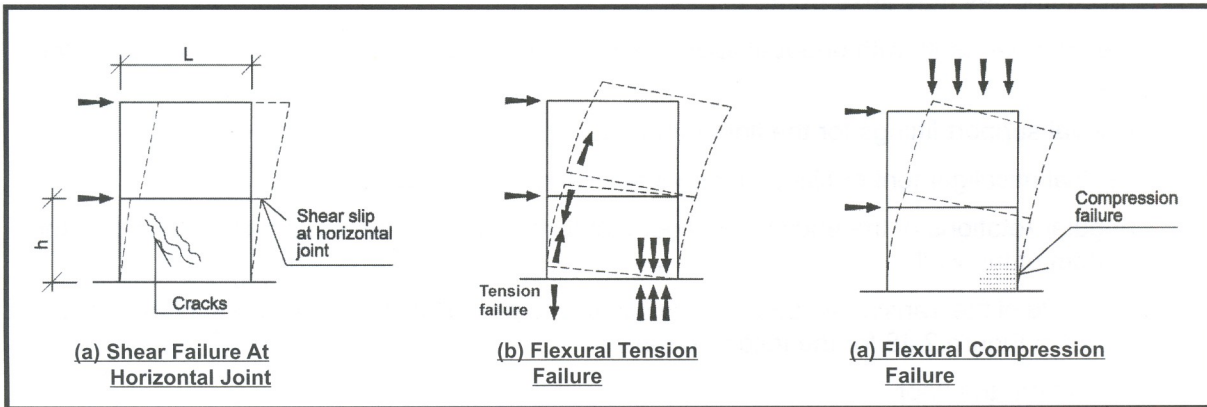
Failure Mode Of Cantilever Precast Concrete Walls
